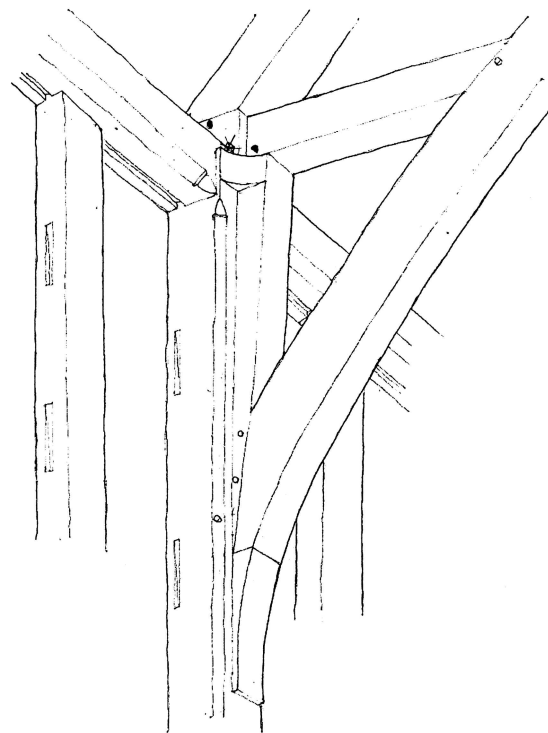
Sketch showing assembly of timber frame at east end of central cross frame (Richard Bond).
